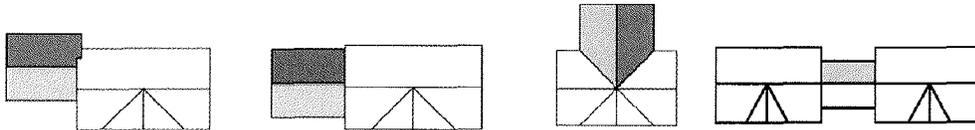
C. Four examples showing appropriate methods of locating an addition on an building, to the side and rear. (New addition shown shaded.) Each example builds off from the original building in such a way that it is offset from the existing facades slightly, which helps integrate it with the scale and character of the original building.
